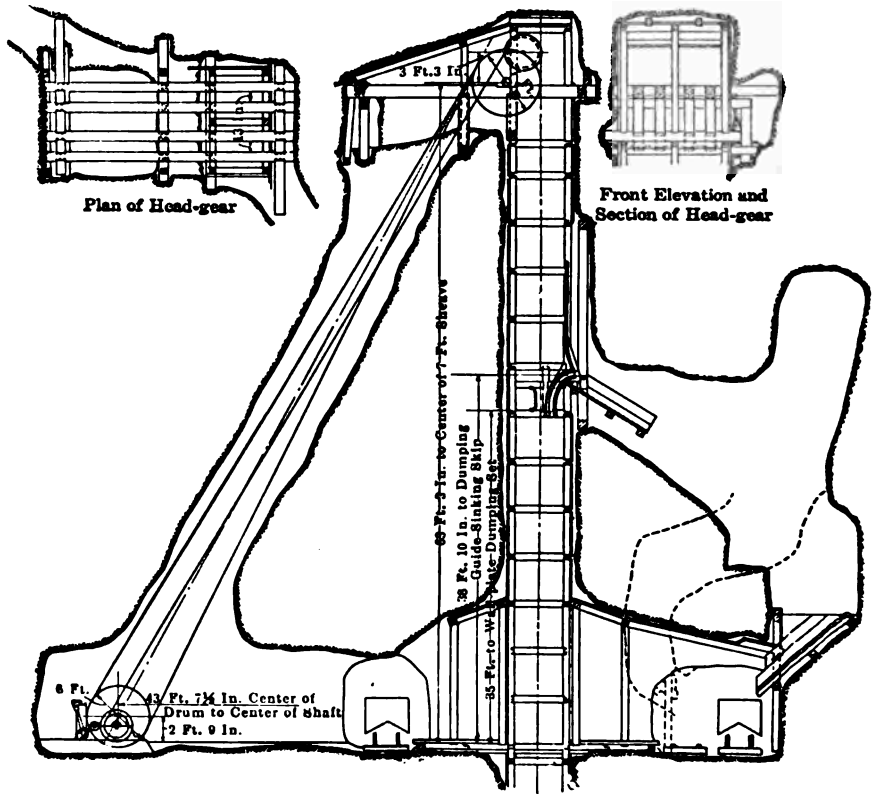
ARRANGEMENT OF AN UNDERGROUND HOIST.
